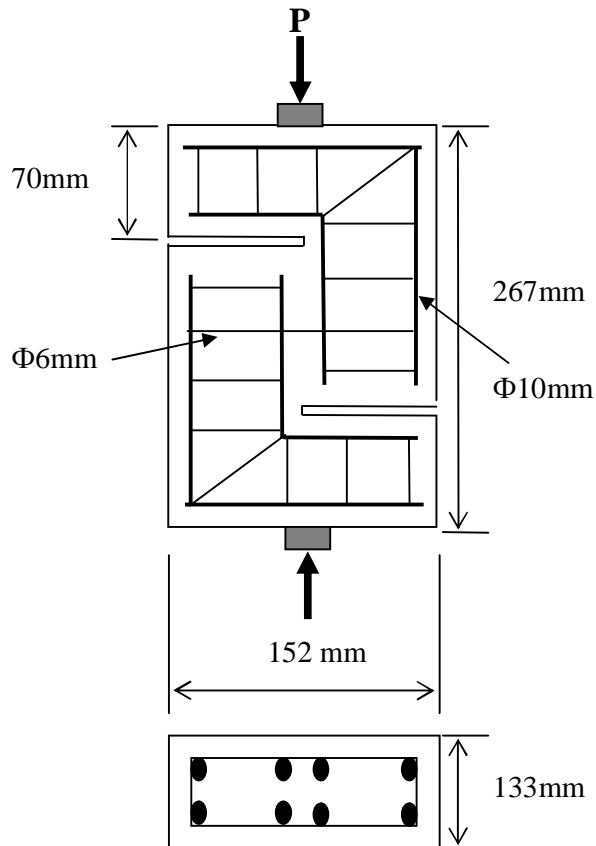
Direct Shear Dimensions for Double L-Shaped Specimens.
